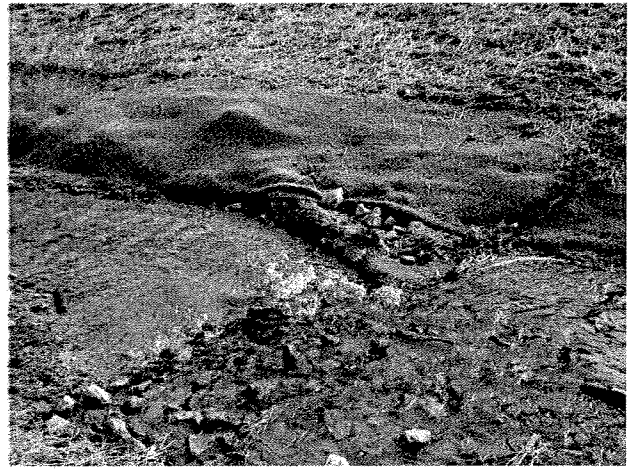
Looking downstream from LT Station 12+10 at root wads installed between MC Stations 12+45 and 12+65. (9/27/04)
